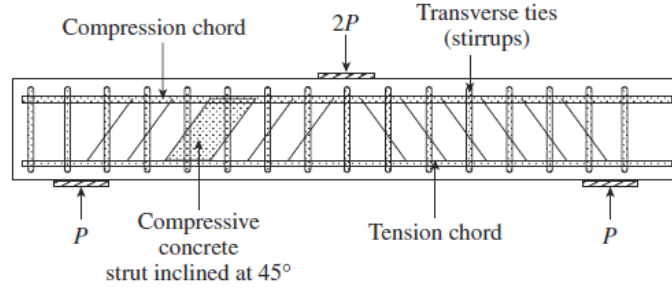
Ritter-Mörsch truss model (Subramanian, 2013)
